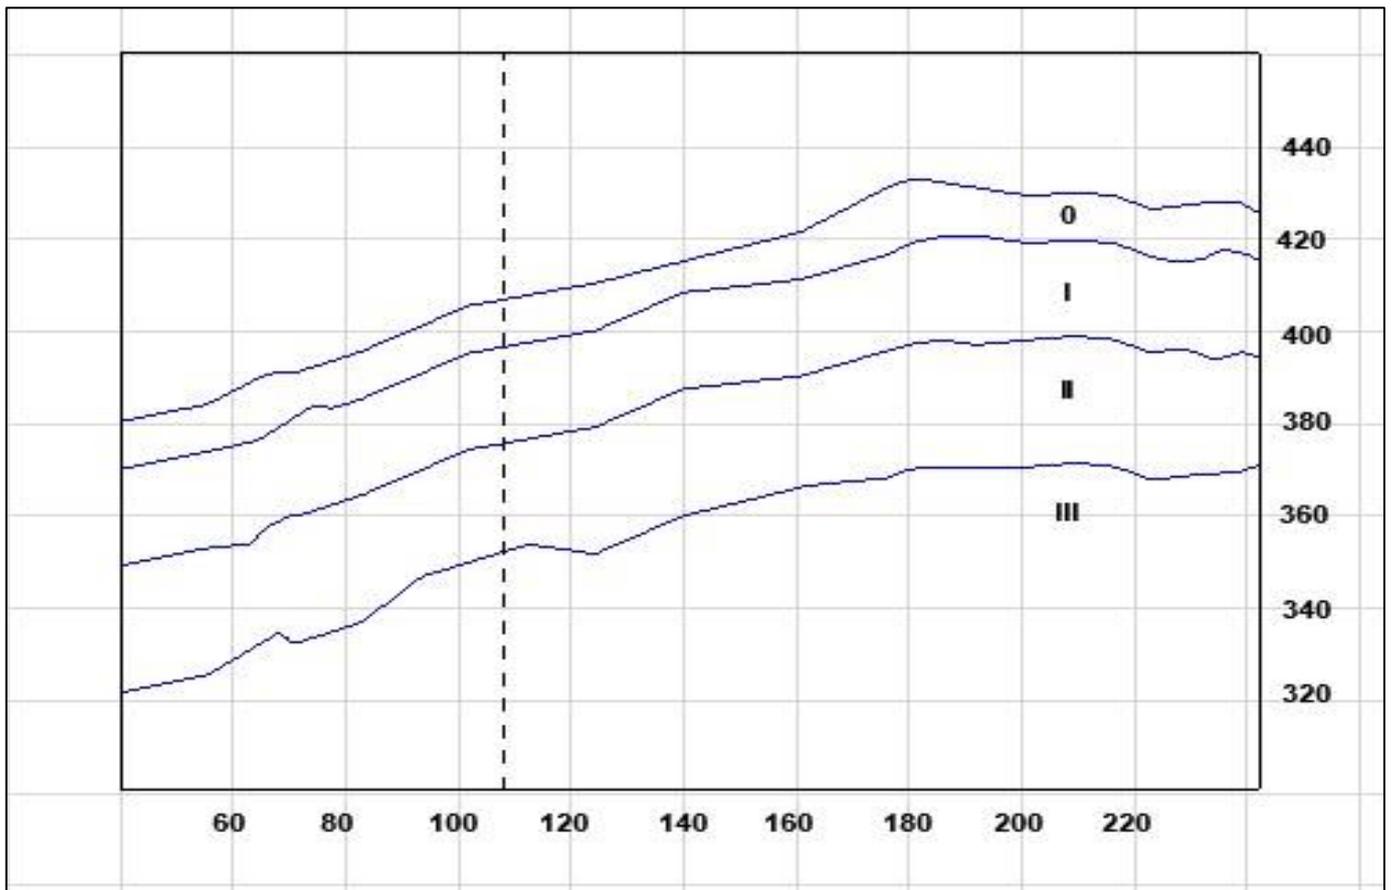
Soil Layers before Excavation (Archi-cad 2019)
